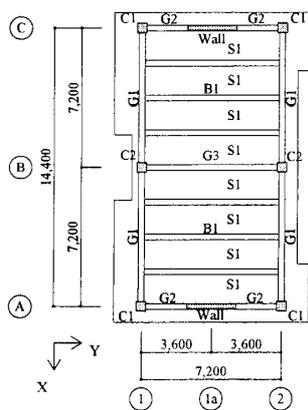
Plan of 2nd to 4th floor (Unit: mm)
